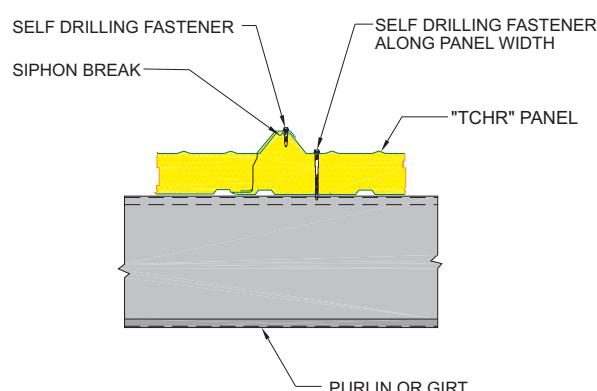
DETAIL-A : "TCHR" ROOF AND WALL PANEL AT CORNER EAVE
